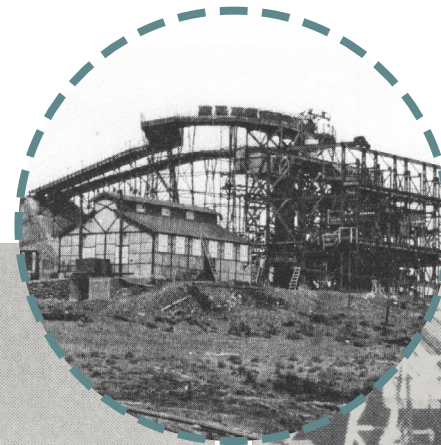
Wash Plant & Power Station - mechanical plant installed 1930s (Carstens, 2001: 89)
